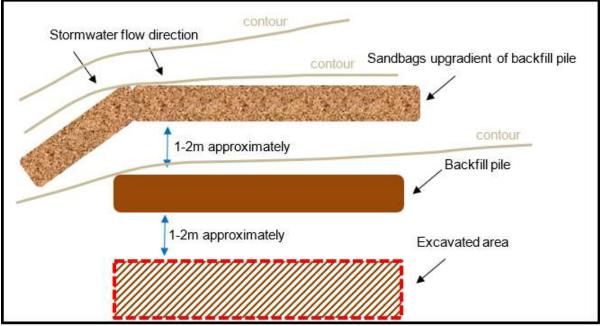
Site Specific Example Layout of Typical Trench / Excavation Working Section
